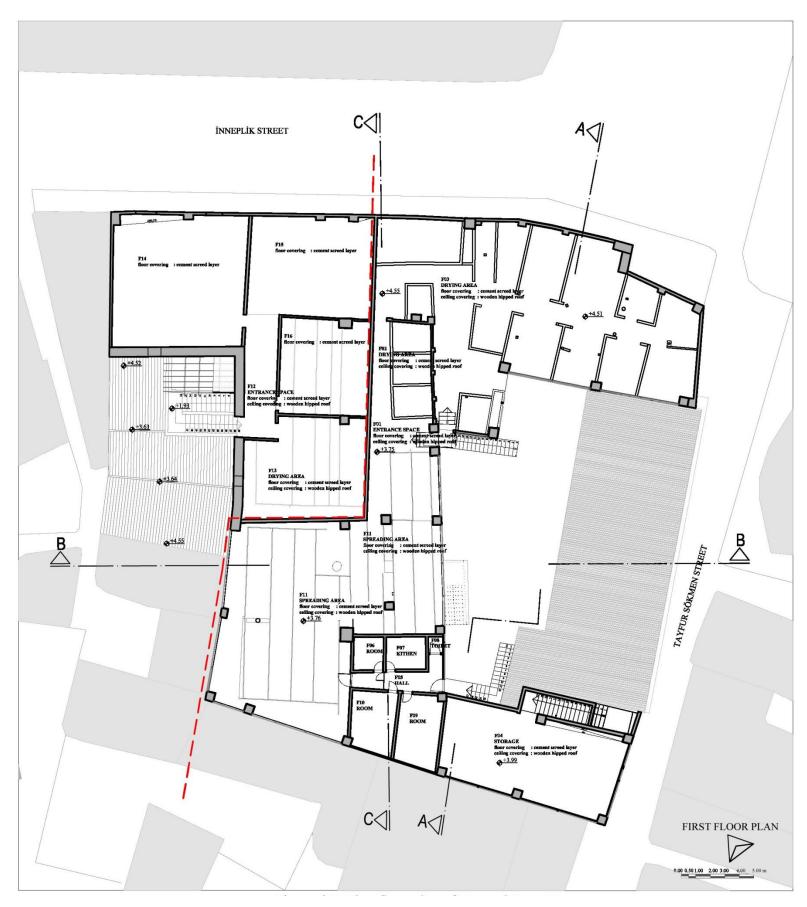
The first floor plan of Kuseyri Soap Factory
